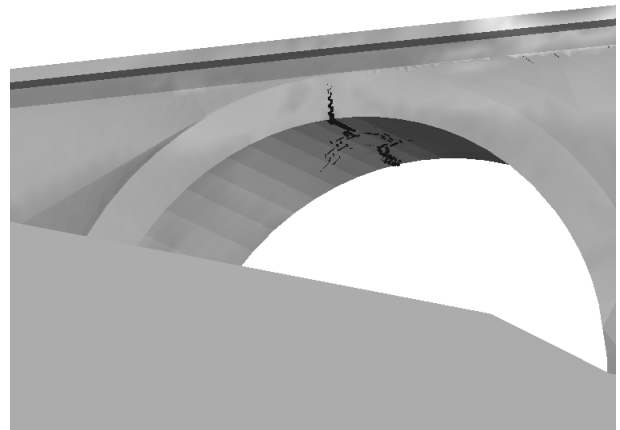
Cracks at the bottom side of a masonry arch bridge.
